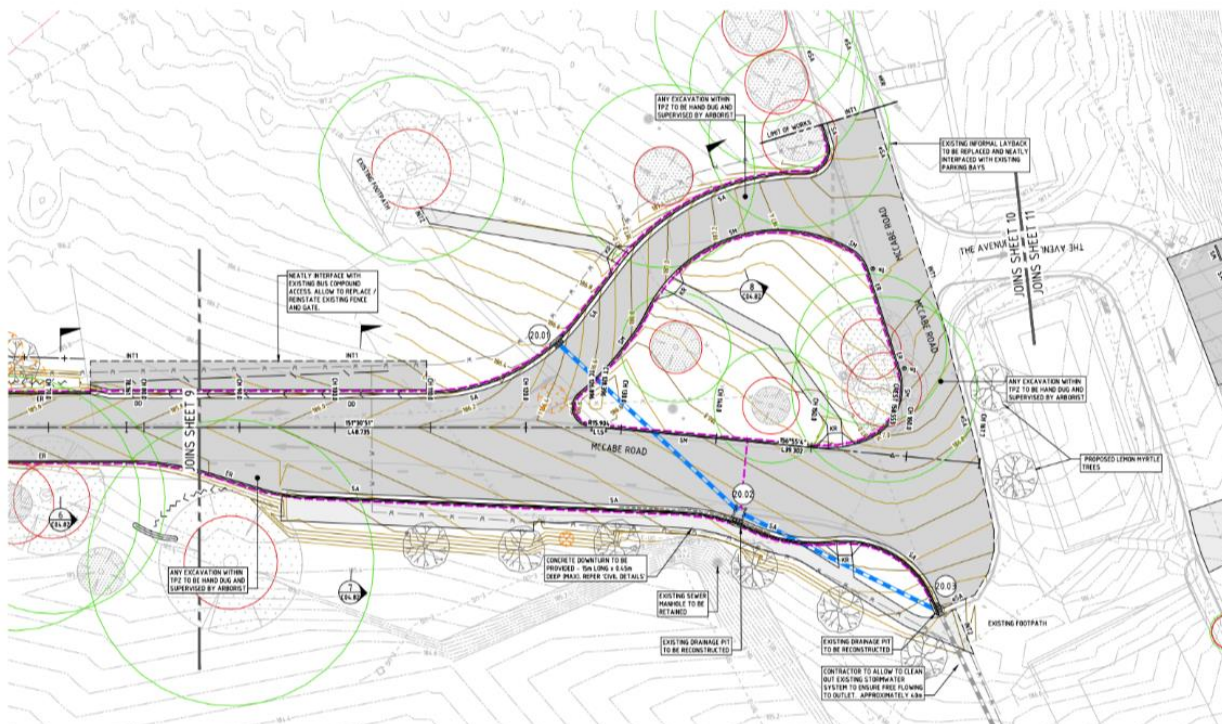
McCabe Road upgrades Sheet 2 (Source: Northrop)
